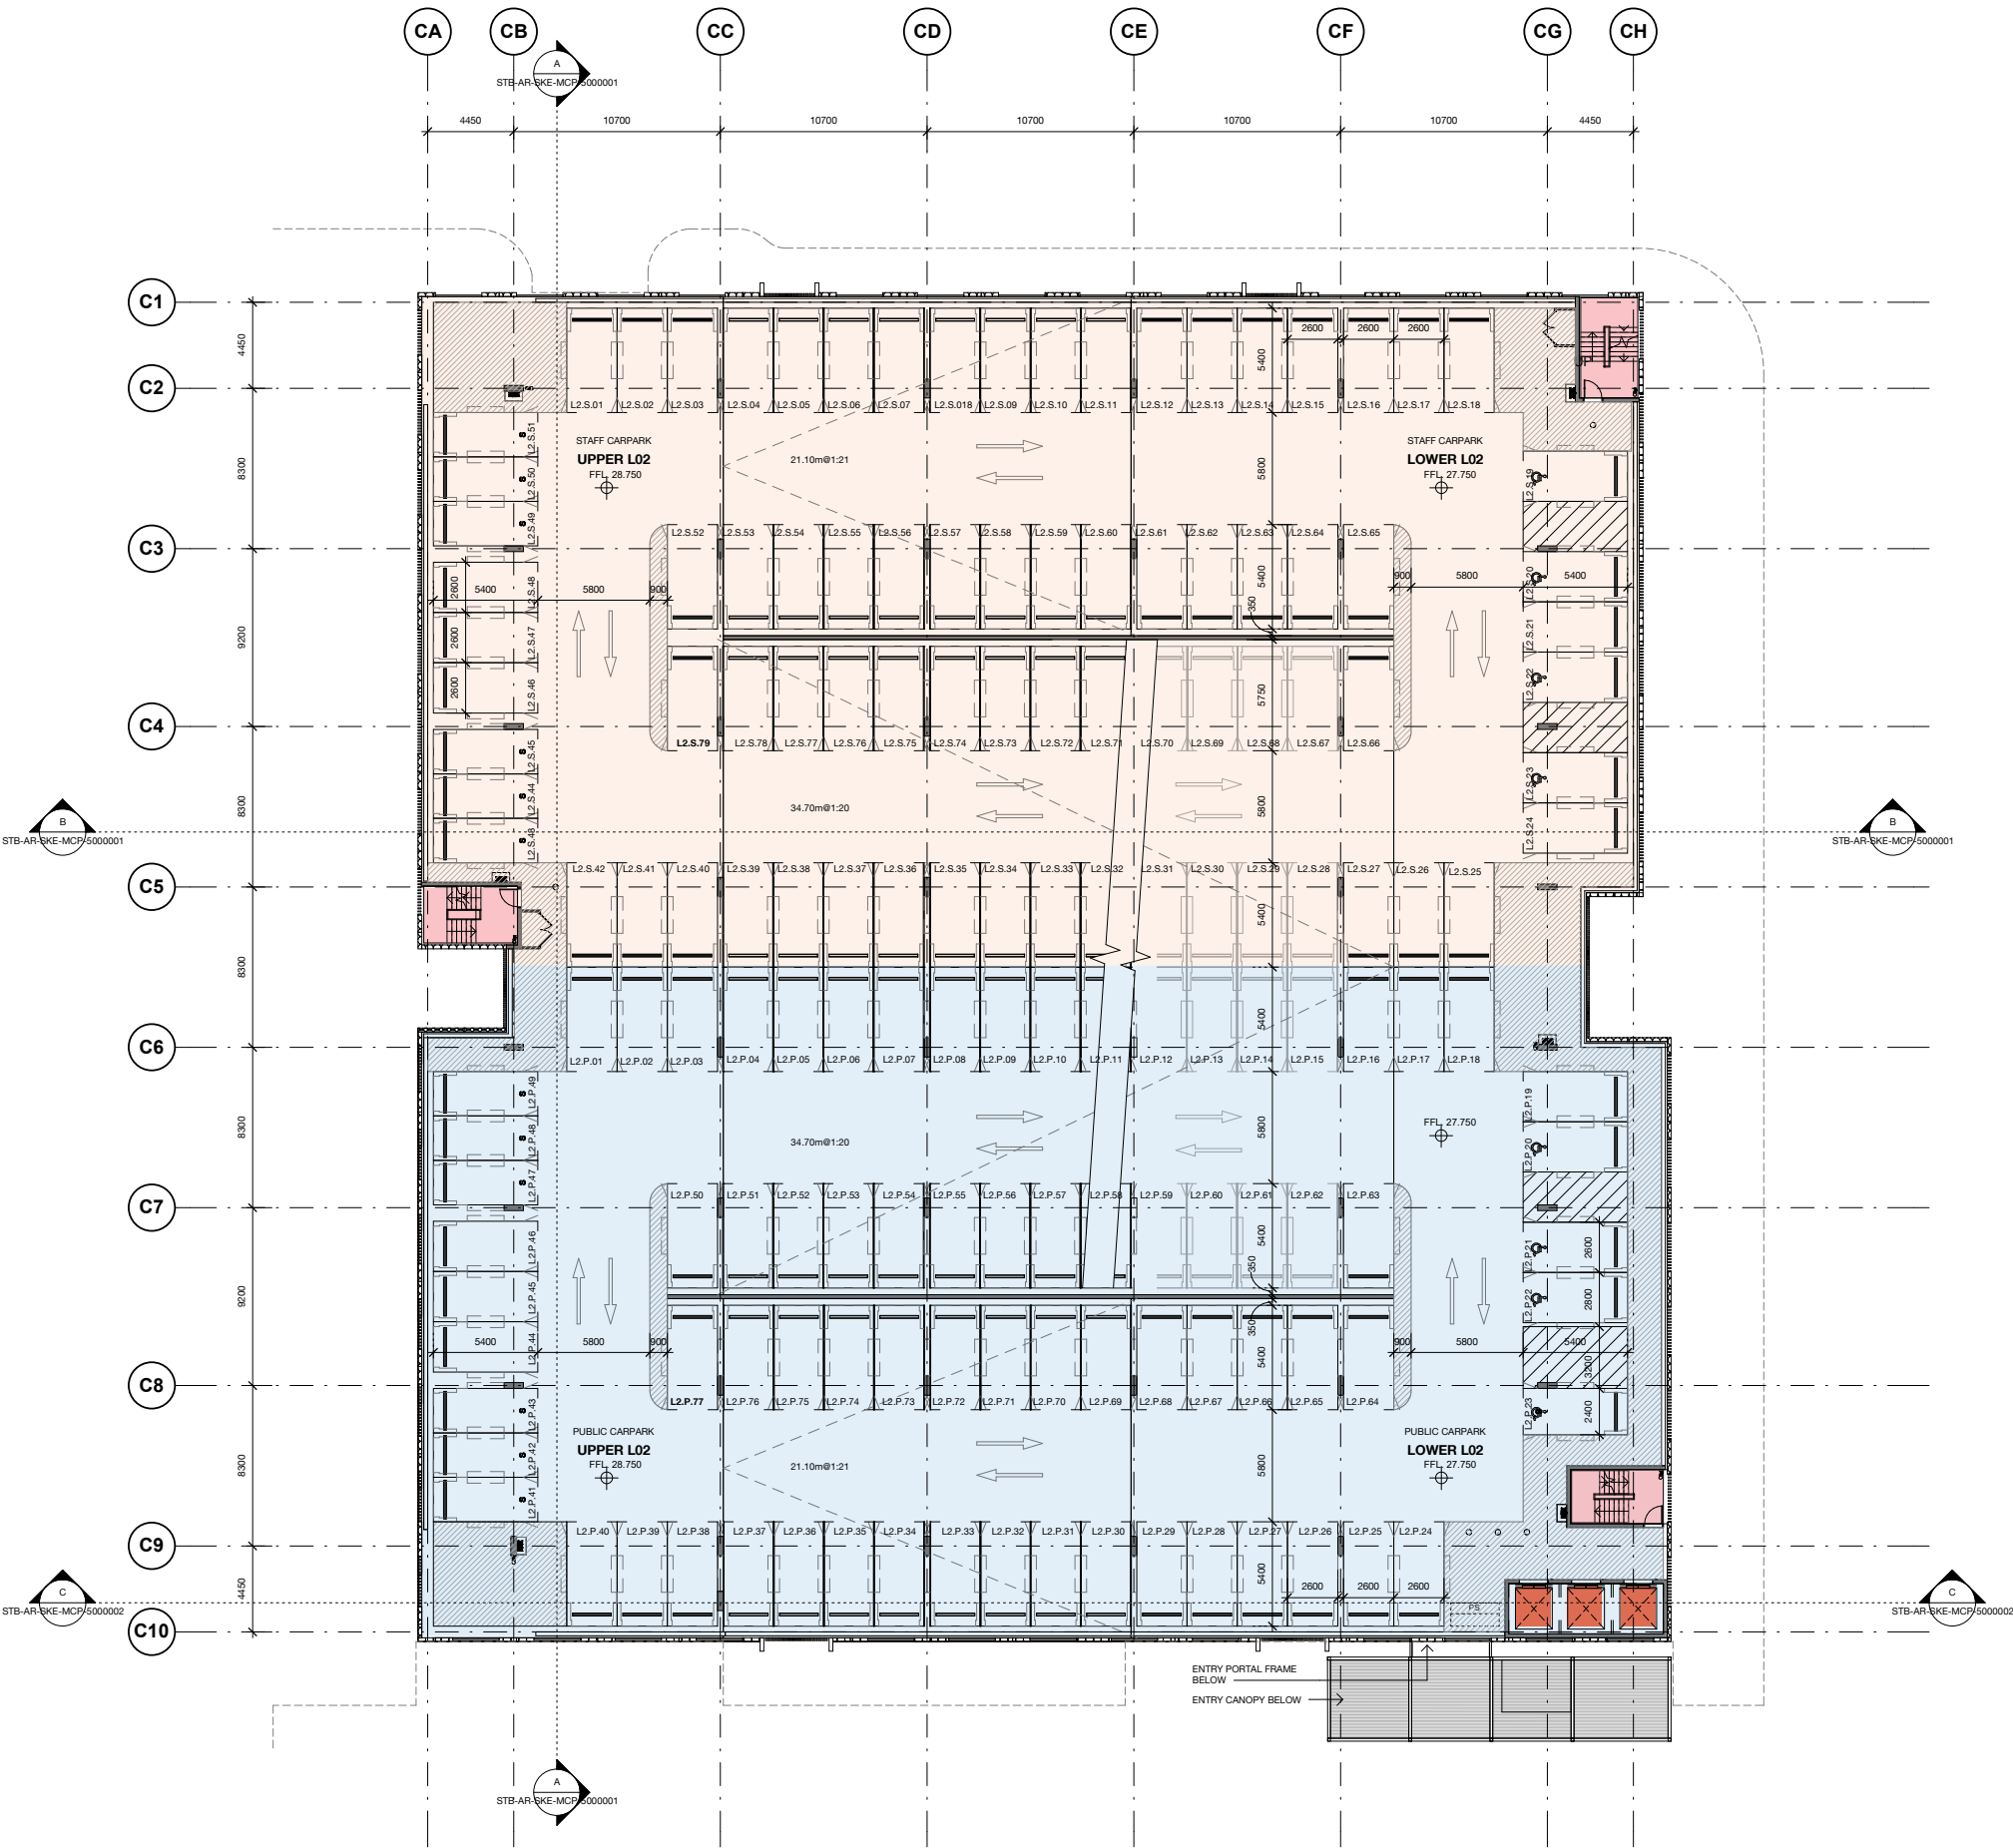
Multi-Deck Carpark, Floor Plan - Level 2
